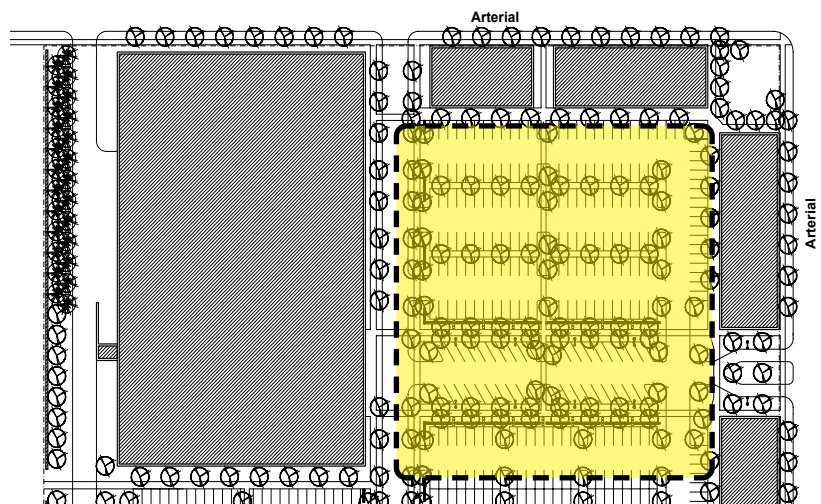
S1.b: Parking is located to the rear of street facing buildings.
